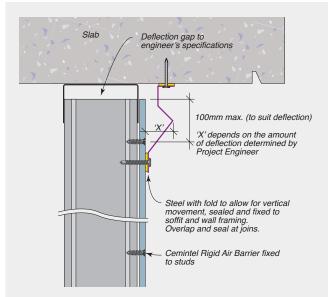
RECESSED – JUNCTION AT SOFFIT WITH DEFORMABLE FLASHING – RIGID AIR BARRIER
